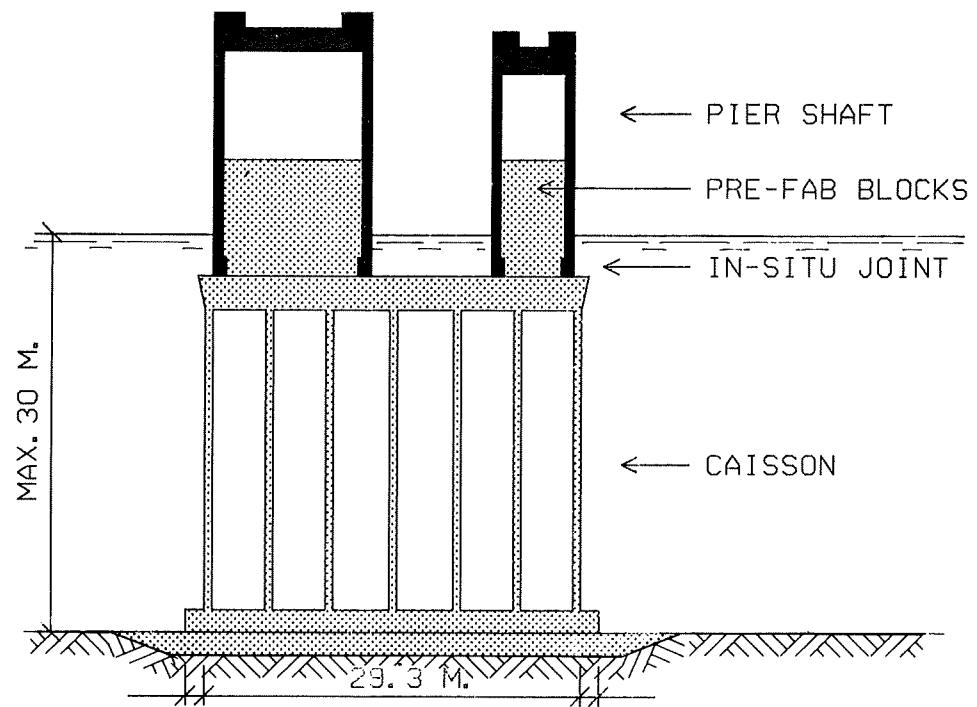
Precast Concrete Caisson and Pier Shafts.
